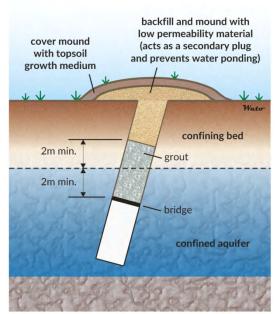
Capping and plugging of drillholes intersecting a single confined aquifer.
